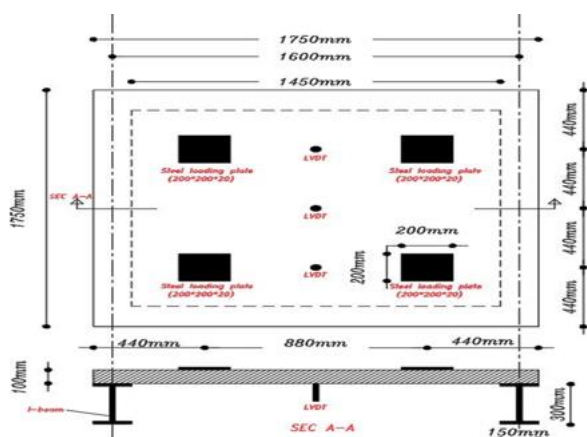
Specimen dimensions, loading and bearing steel plates, and LVDT locations.
